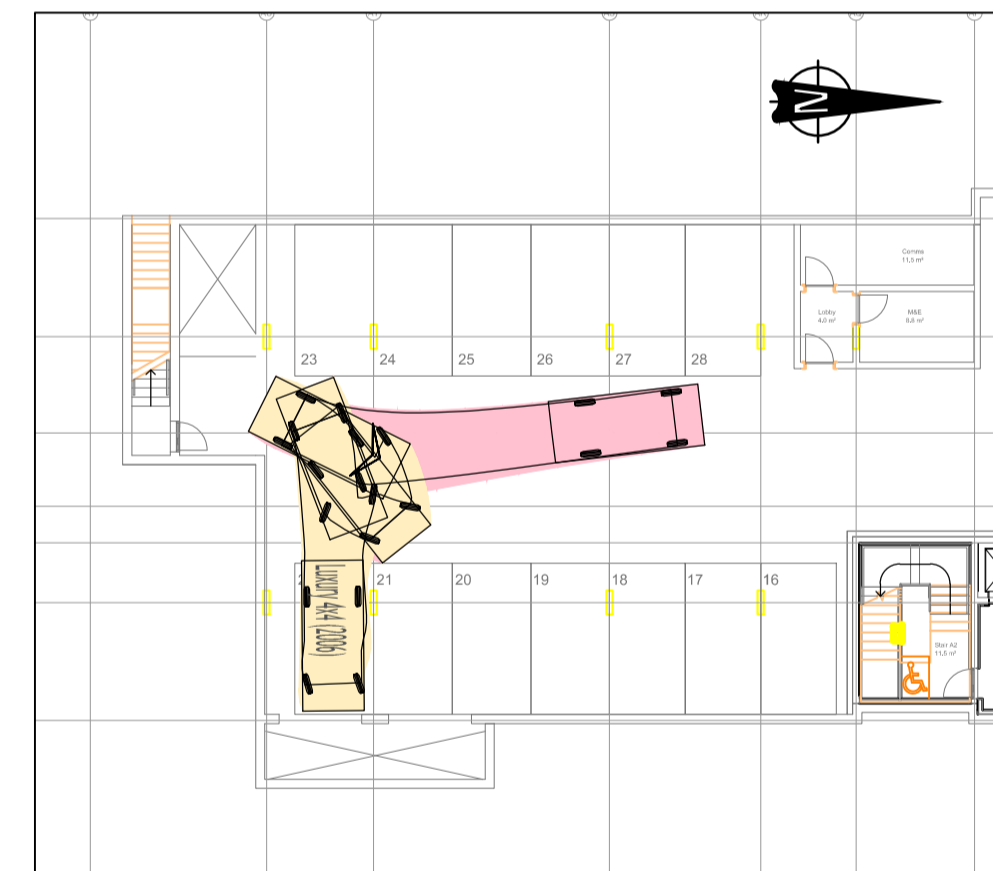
PRIVATE CAR PARKING IN BAY 23
